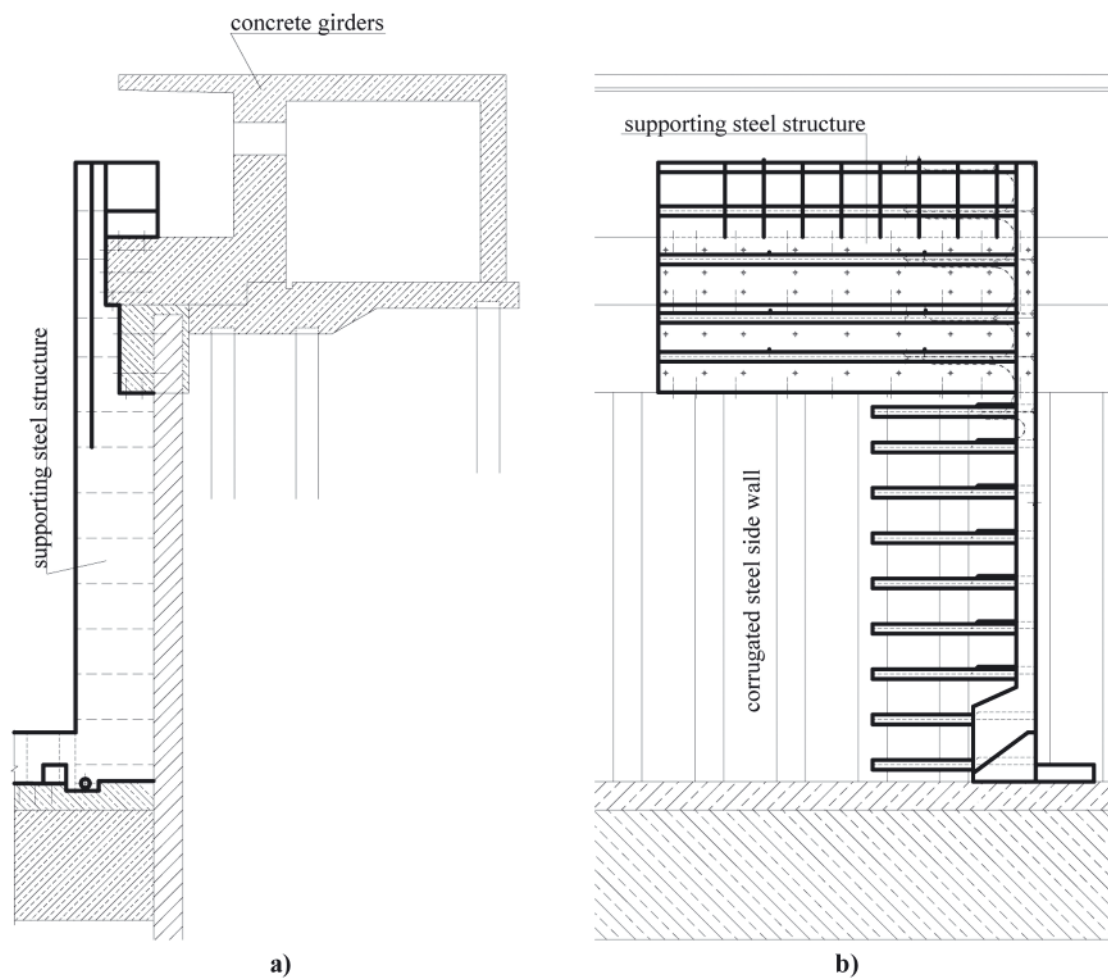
Supporting structure at the dock side walls: a) transverse cross-section, b) side view
